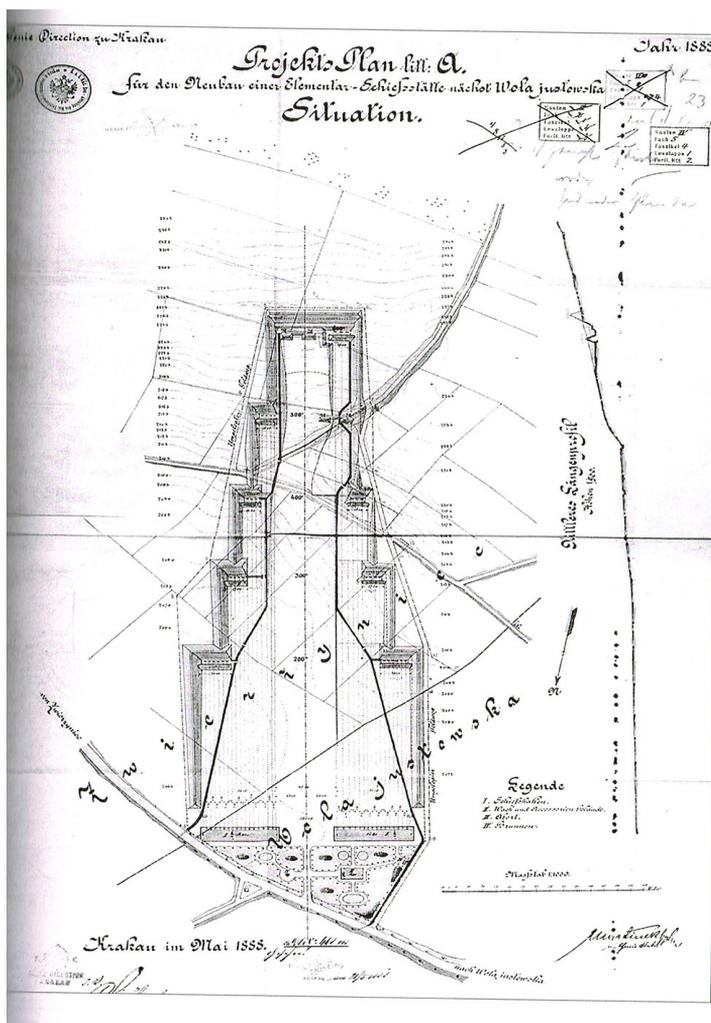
Construction project of the shooting range, dated 1888 with the then yet unimplemented concept of two shooting pavilions (copy of CAW, DOK V, Ref. No.: 1/371/5/95), (Source: PKZ ARKONA Sp. z o. o.)
